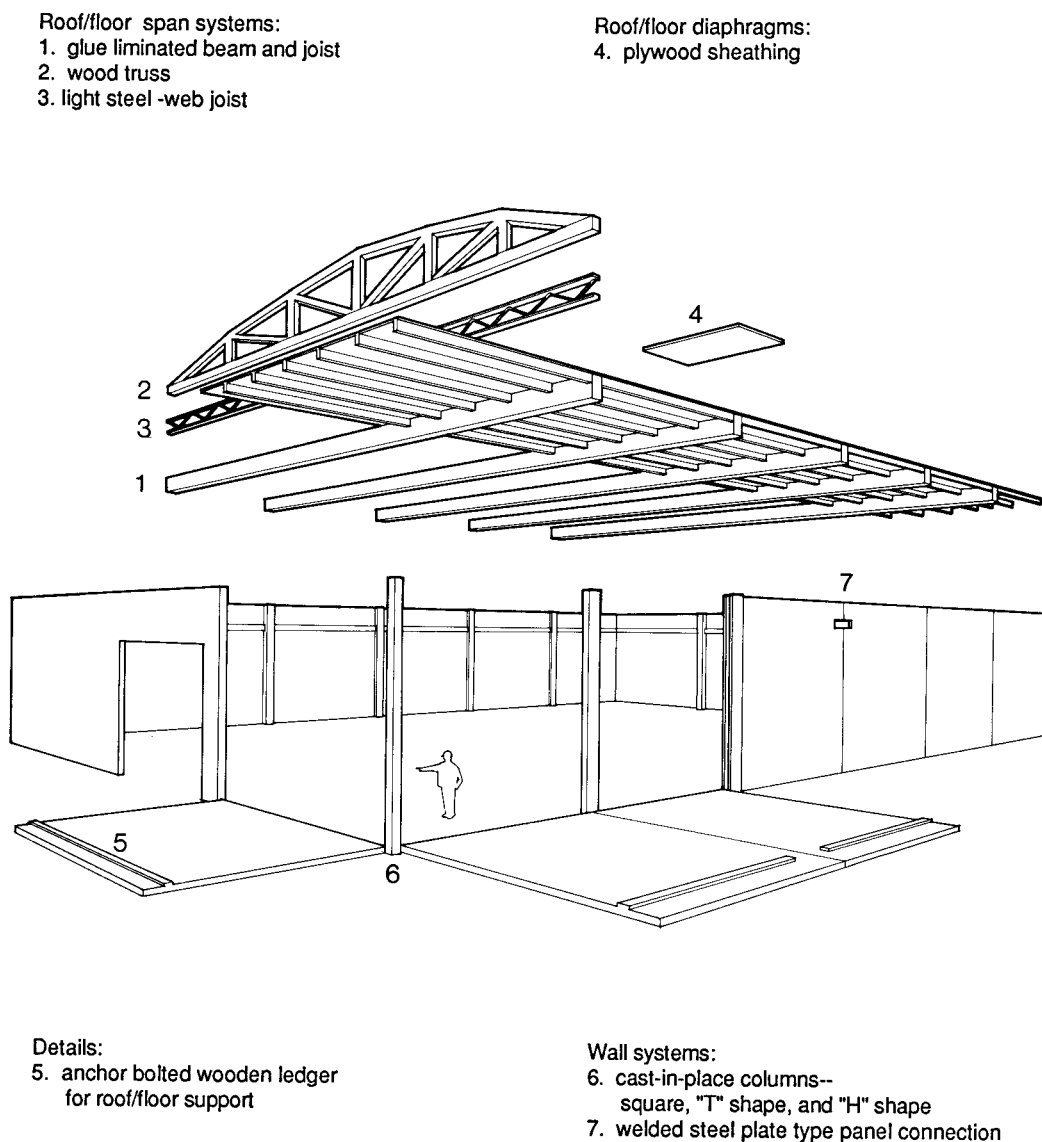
Drawing of tilt-up construction typical of the western United States. Tilt-up construction in the eastern United States may incorporate a steel frame.
